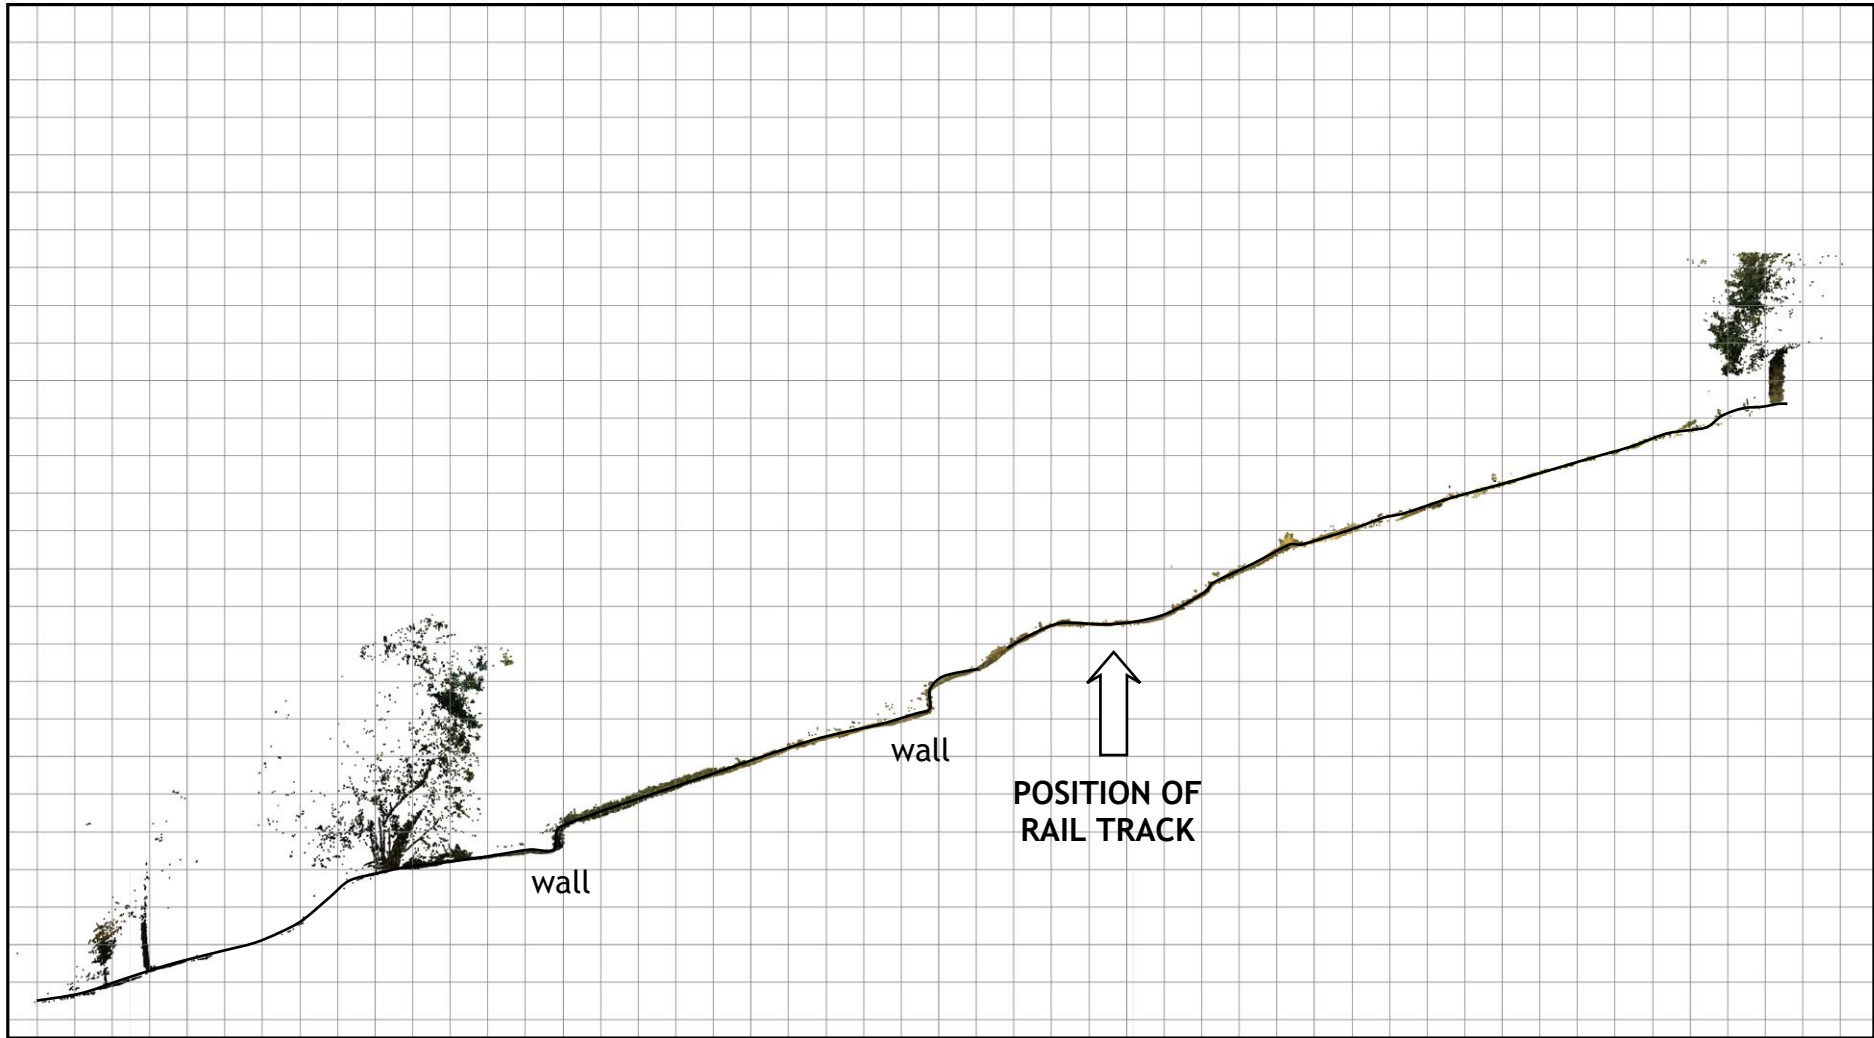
West-east profile across the cleared area at Loner's Lair, Duffield Bank, Derbyshire showing positions of walls and the track -bed of the former railway, at a position about 30m south of the Long Tunnel. Scale 1:200.
